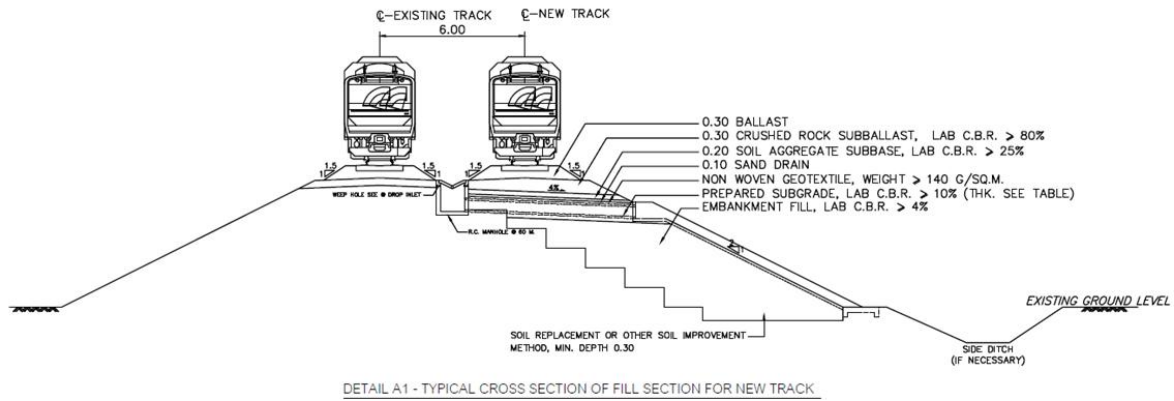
Typical section of embankment: Surat Thani – Hat Yai subsection
